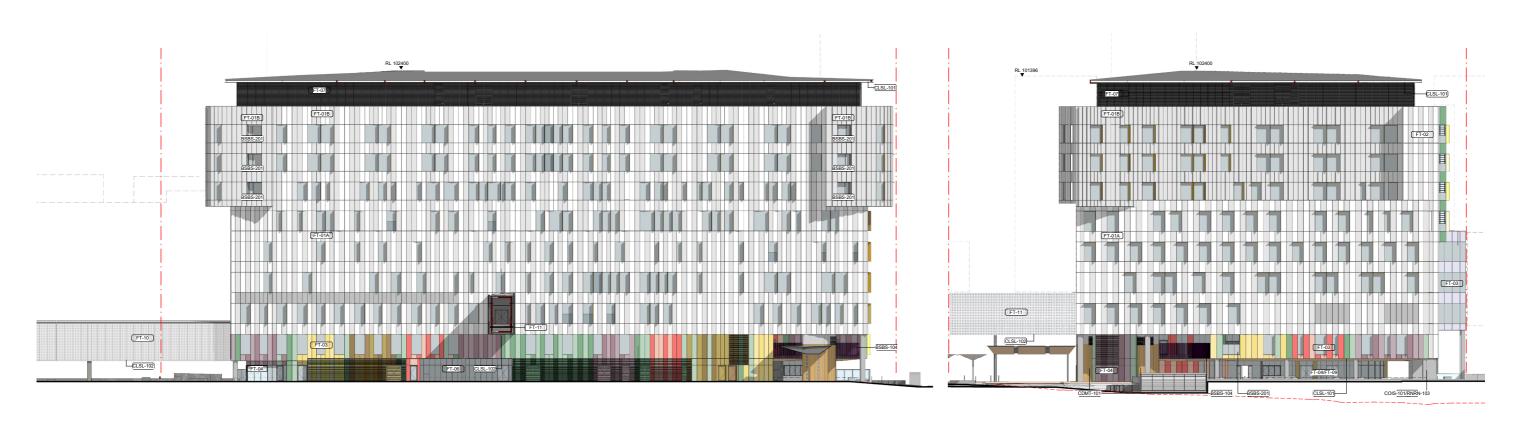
SCH1/ CCCC Elevation : Hospital Road
